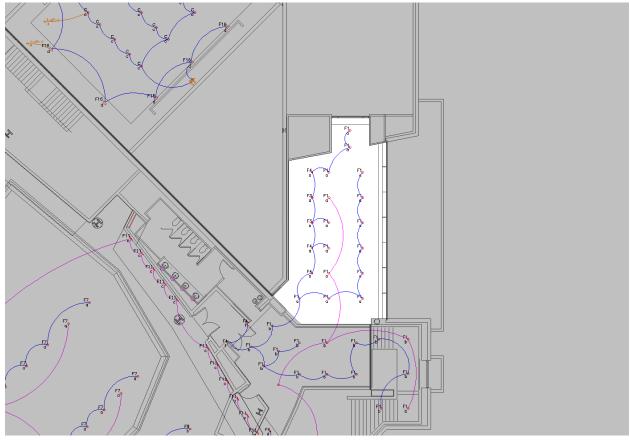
Main Lobby – Balcony Level North Lighting Plan
